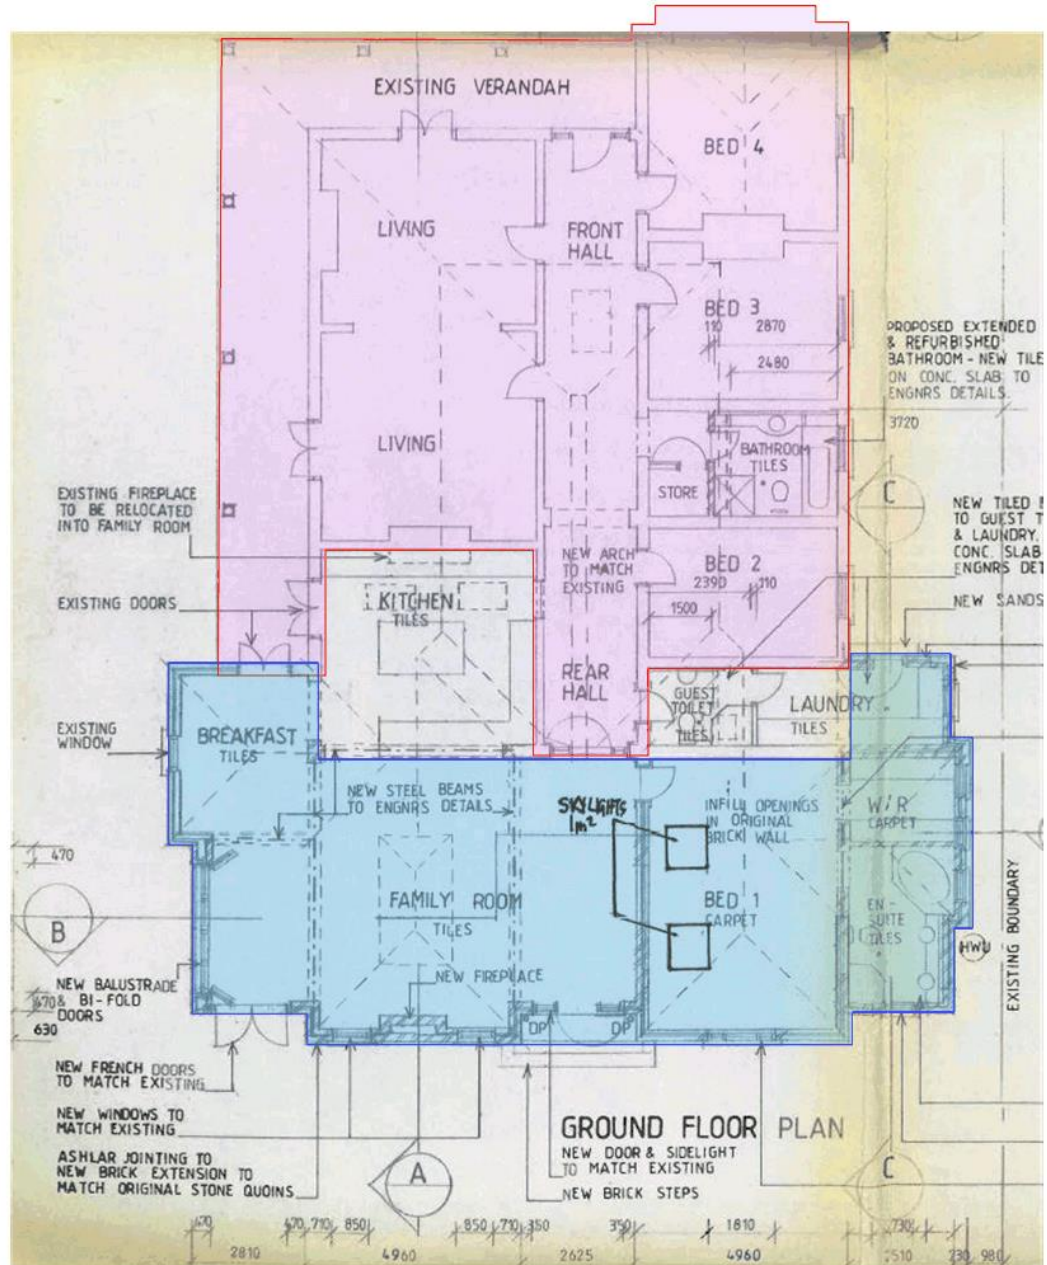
Ground Floor Plan of sympathetic additions designed by Otto Cserhalmi & Partners P/L in BA 257/94
